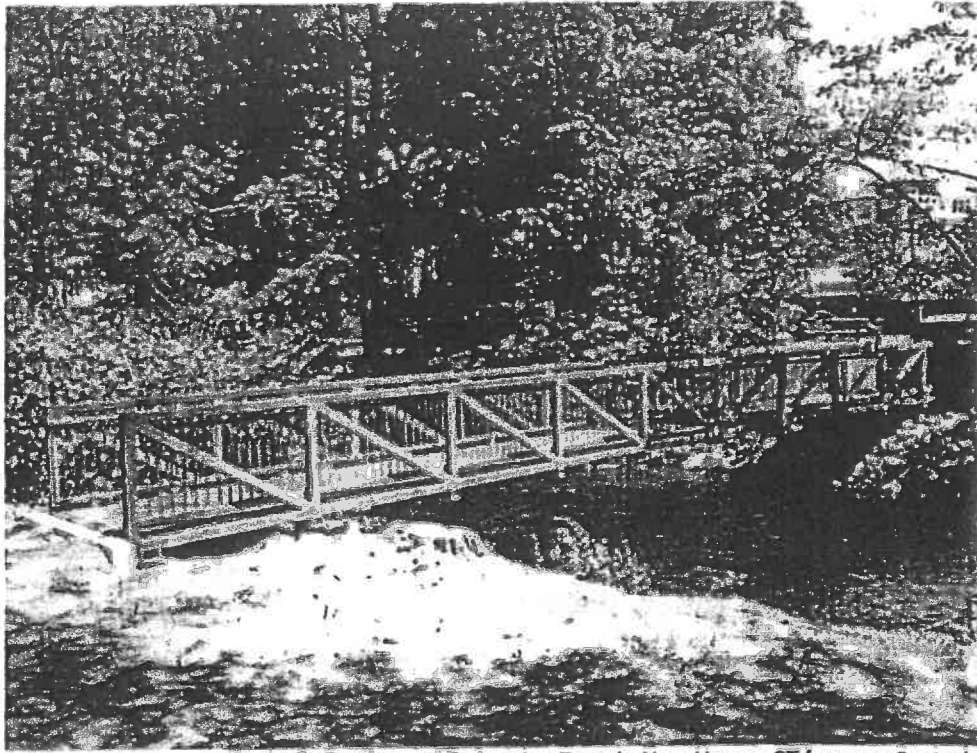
Continental Pedestrian Truss in New Haven, CT (source: Contech)
